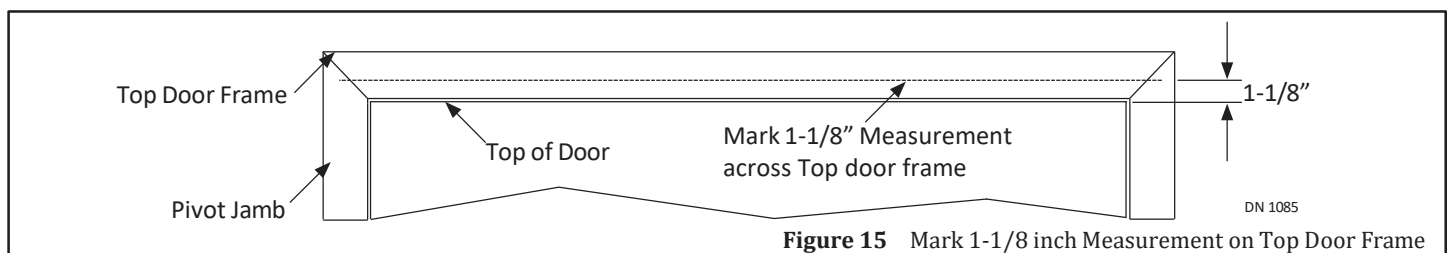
Mark 1-1/8 inch Measurement on Top Door Frame
